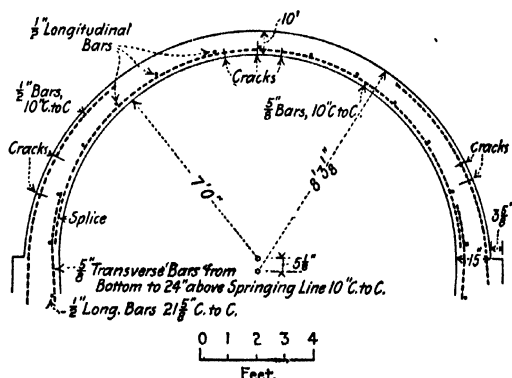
Cracks in sewer arch caused by excessive loading.
